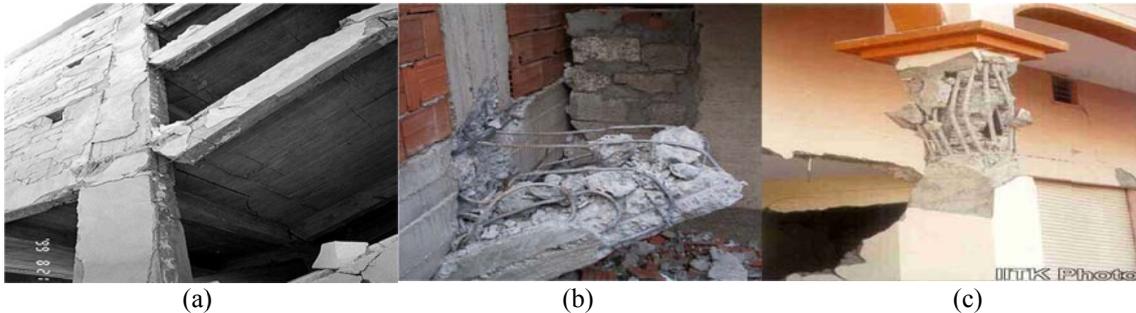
Failure due to lack of ductile detailing: (a) non-ductile details for beam-column joints, Bingo Turkey (Sezen et al., 2003); (b) poor detailing, India (Jain & Murthy, 2001); (c) collapsed column (note the absence of stirrups in a column length larger than 700 mm), Pakistan, 2008
